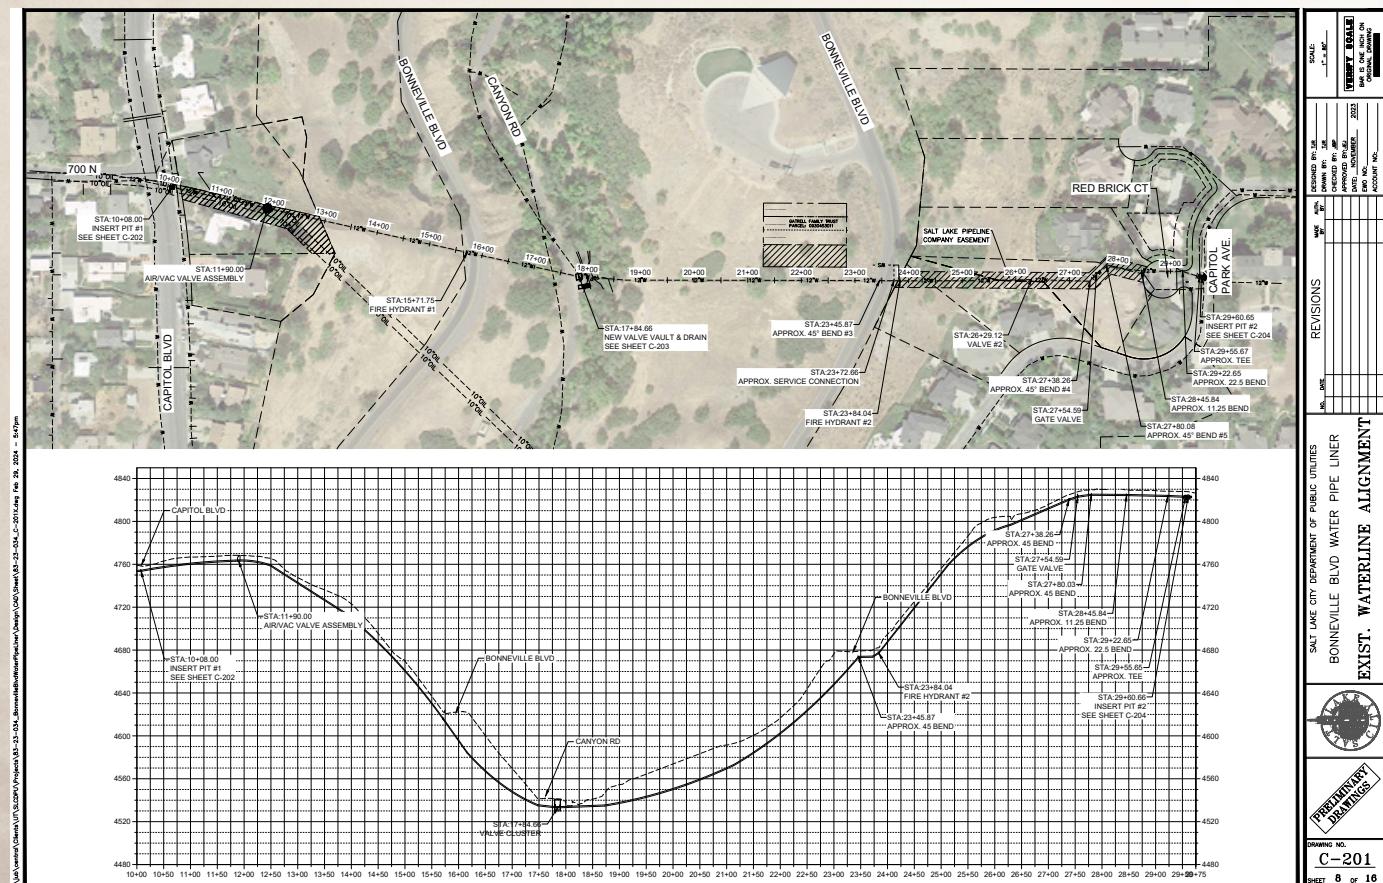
Plan, Profile, and Aerial of Bonneville Boulevard Waterline
